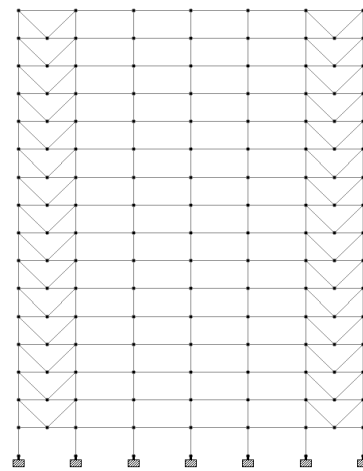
Typical Elevation of 16 Storey Building with V-Bracing
